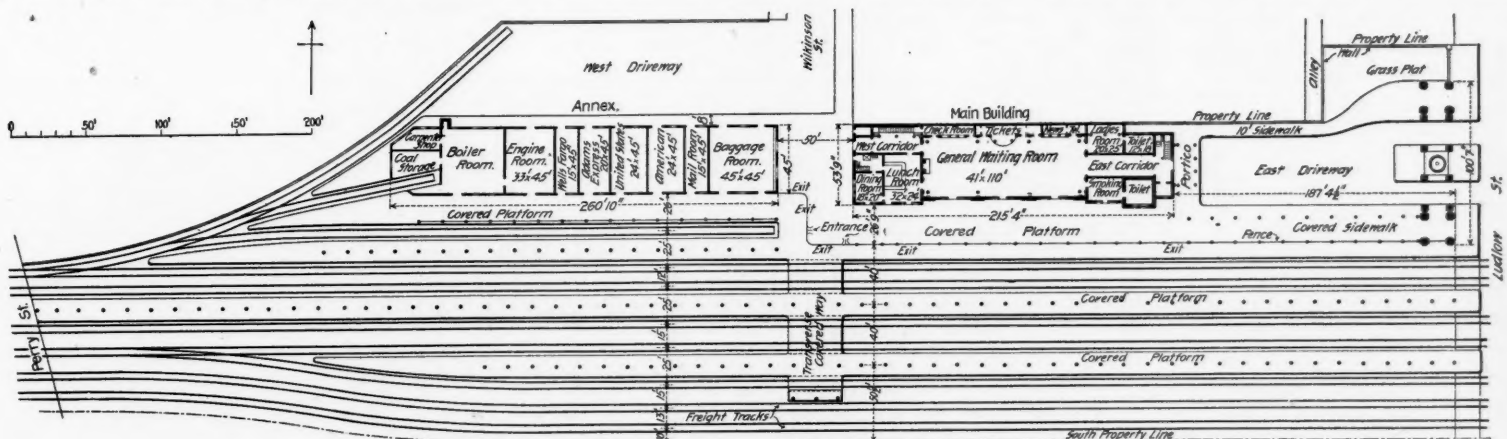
Dayton Union Passenger Station—Plan of Buildings, Approaches and Platforms.
